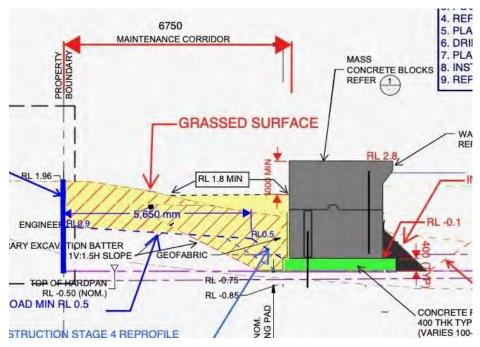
S3 (mass concrete block wall, 2 blocks high)
